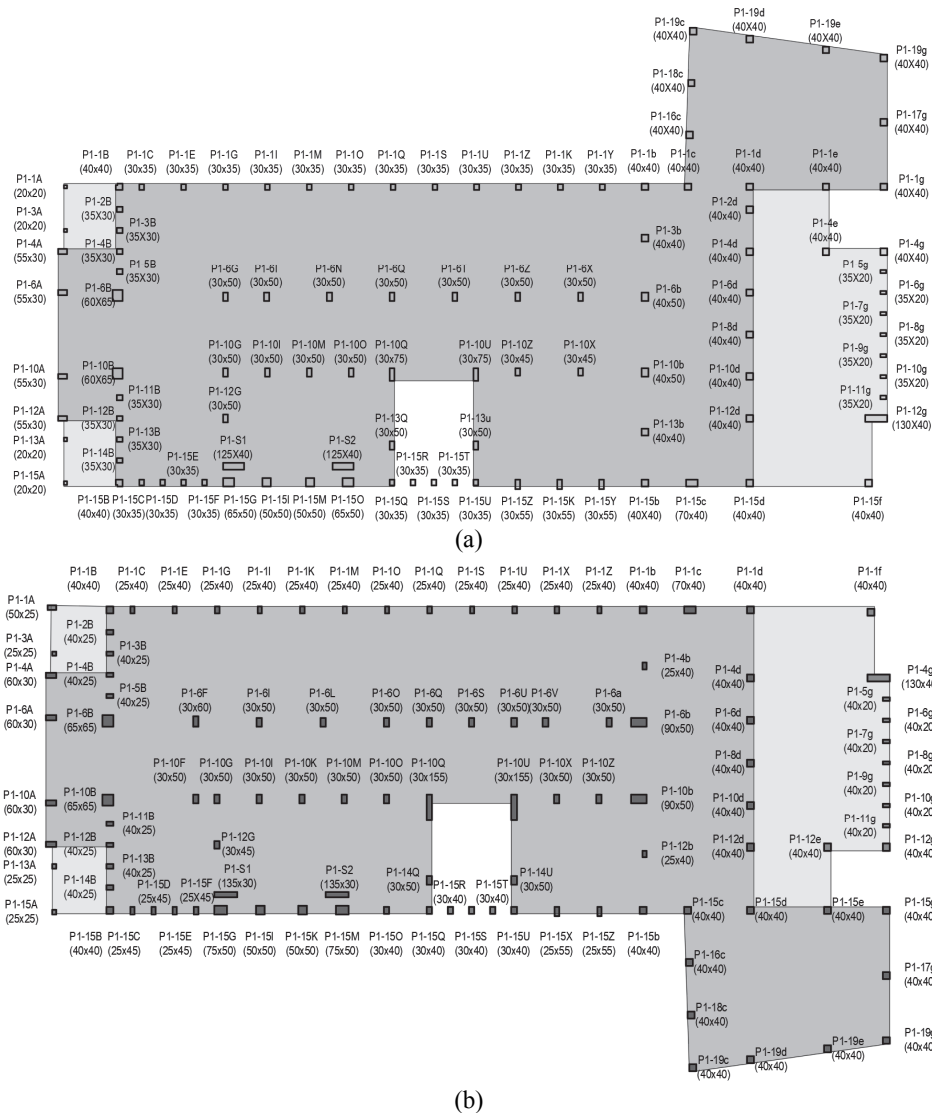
Columns at the ground floor of the Building A (a) and C (b).
